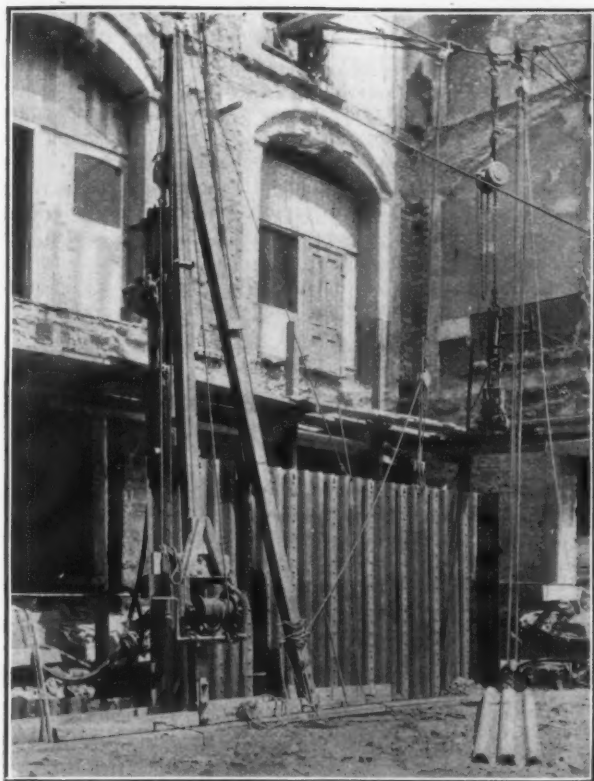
Manner of Driving Wemlinger Corrugated Sheet Piling.
